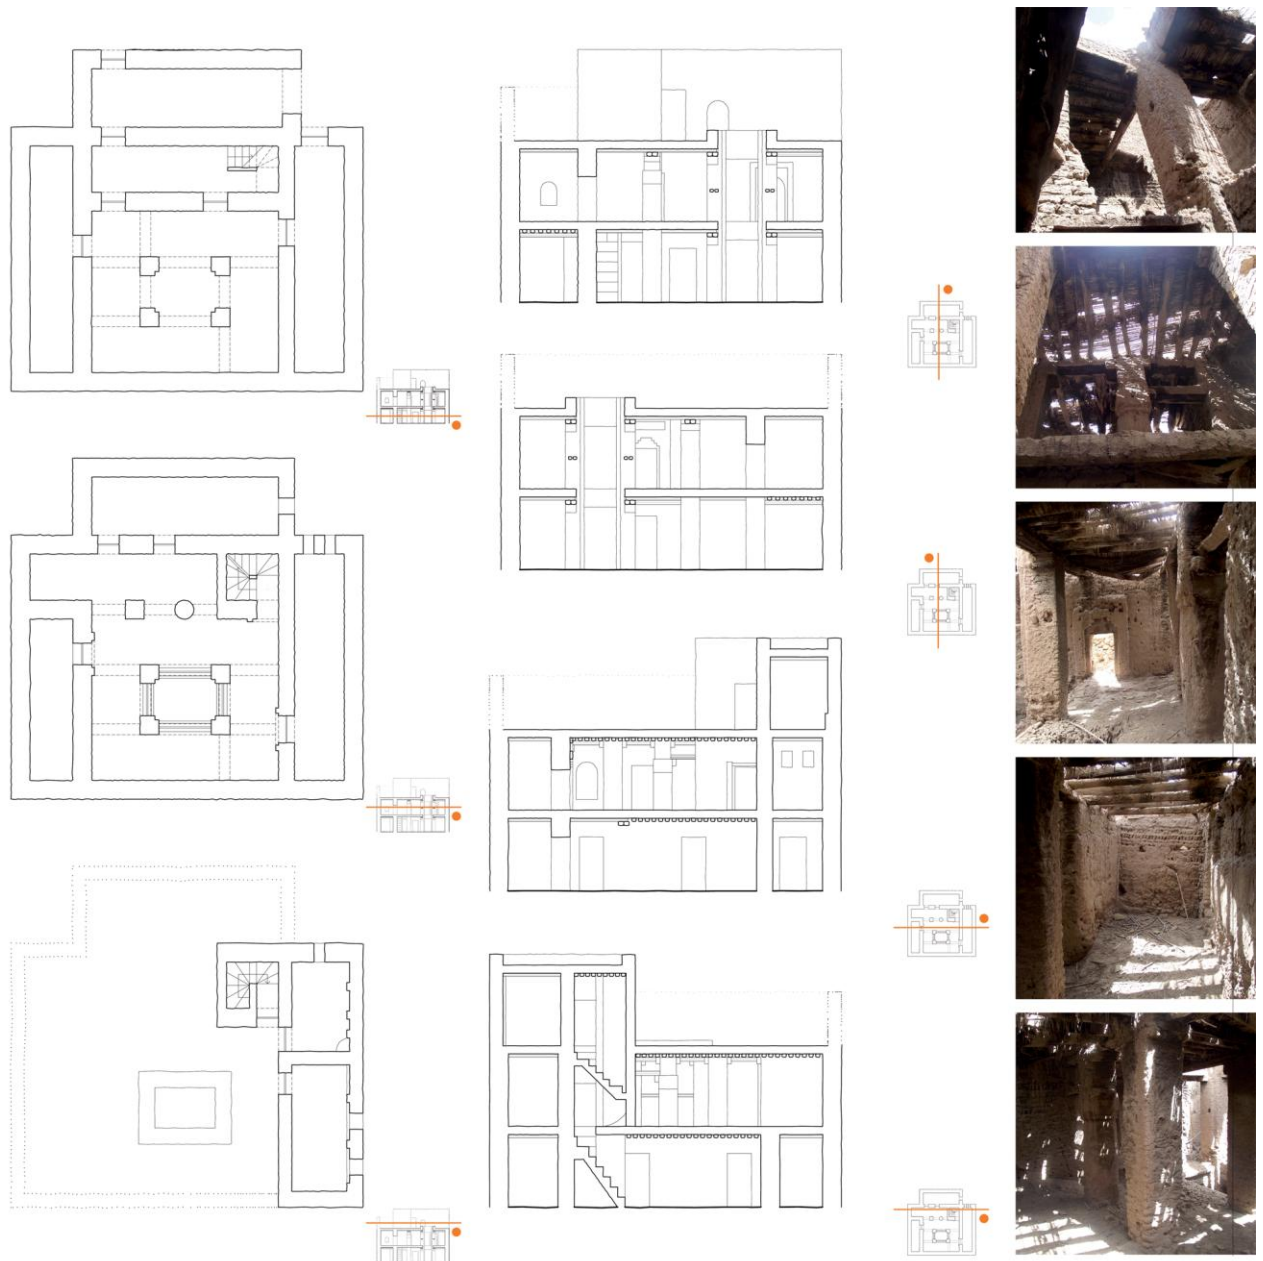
Earthen House in the Ksar of Do Mougni. Plan and section.
